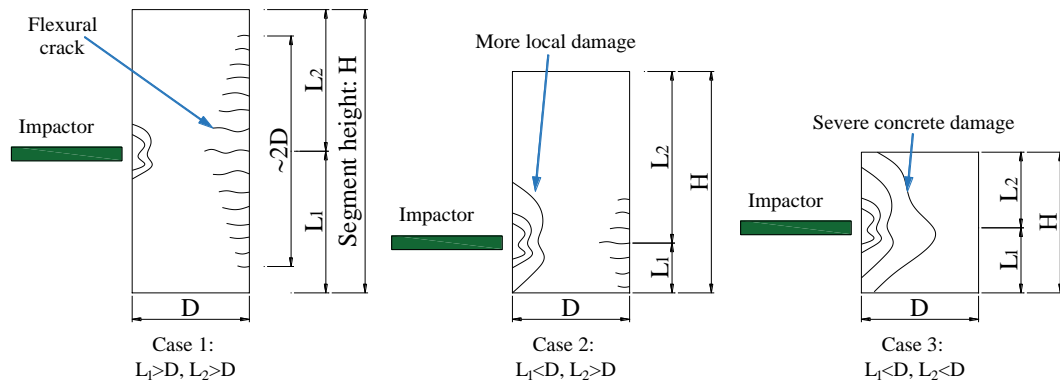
The crack patterns and damage of concrete with different segment height.
